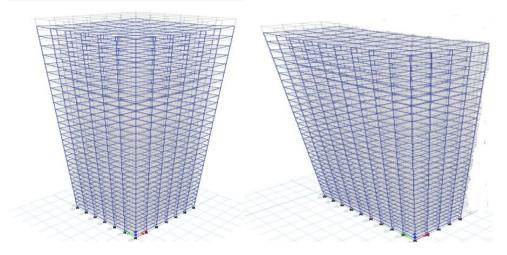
Structural deformation of Square and Rectangular for G+30 Story building
